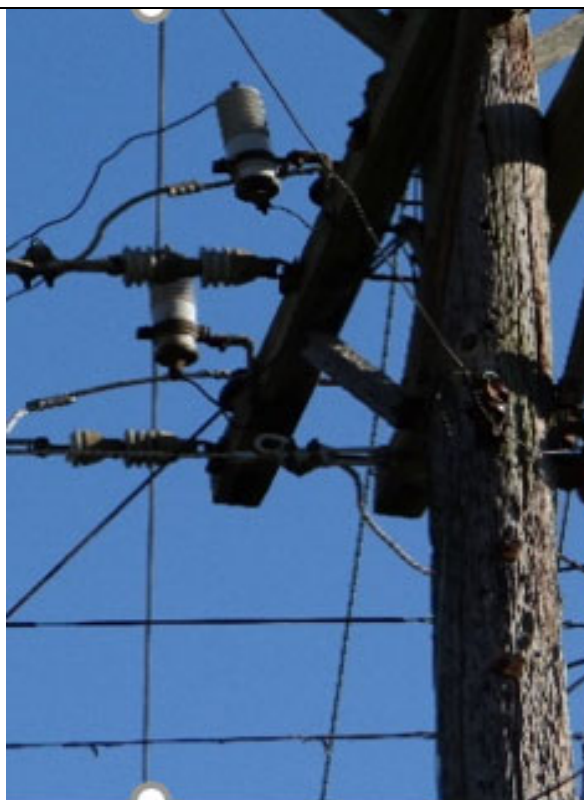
Un-retrofitted arrester station (bare lead wires, poor spacing and insulation, porcelain arresters, no fuse protection, no animal guards)
